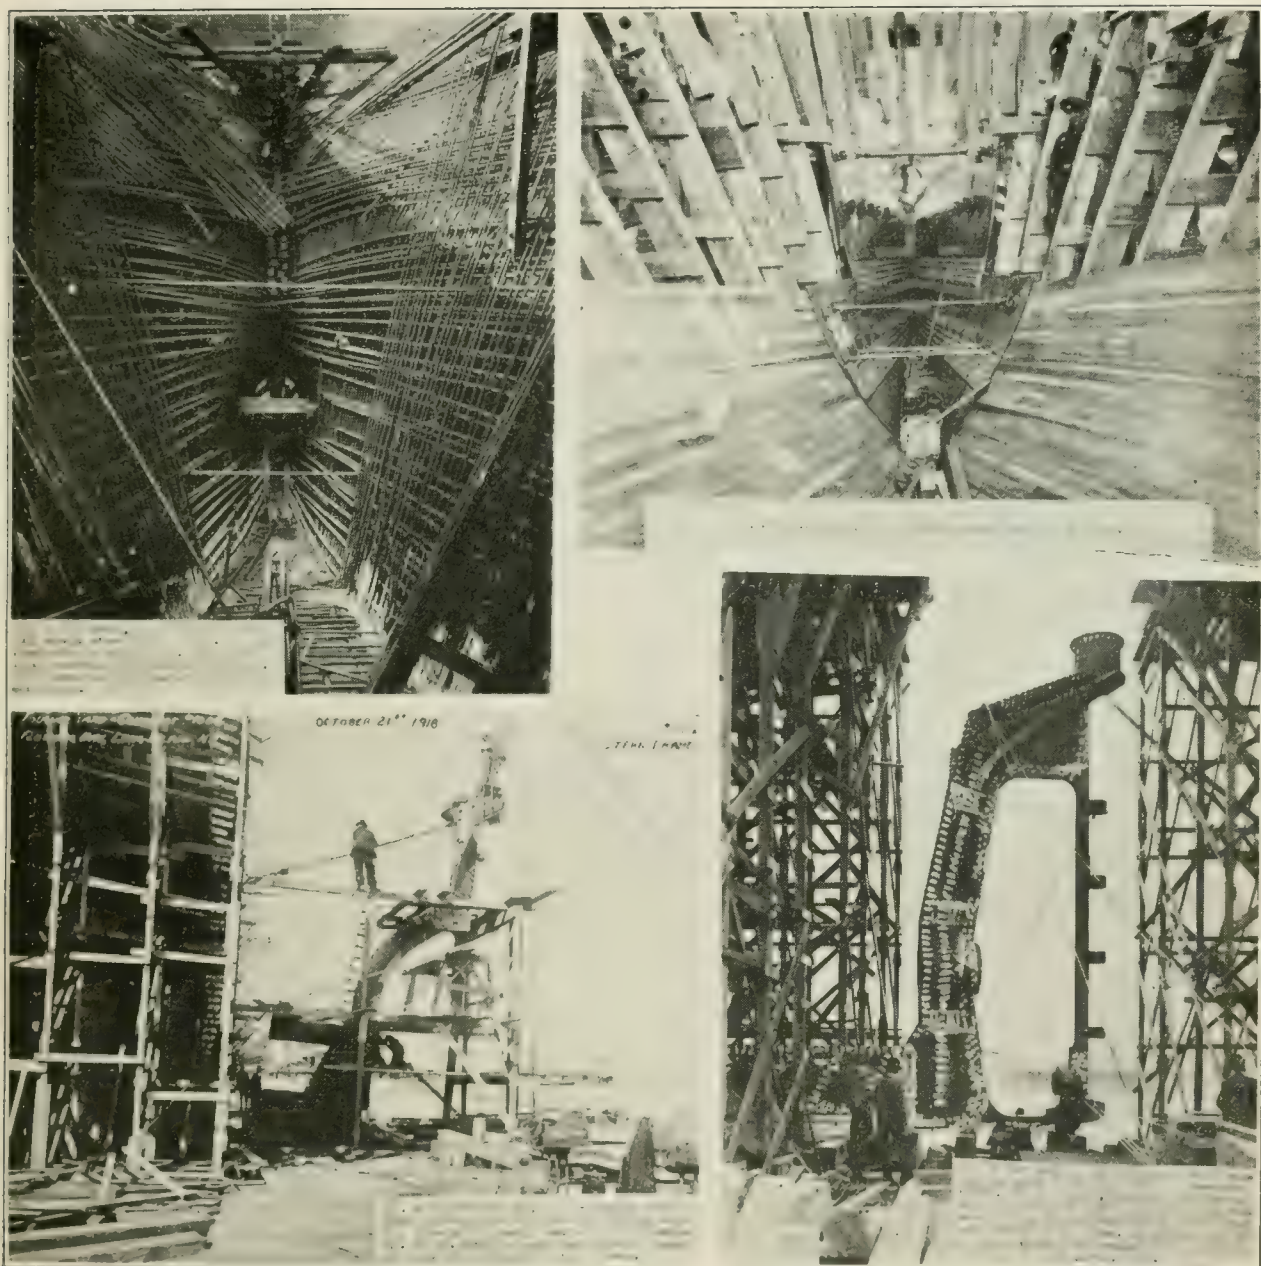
TYPES OF STERN FRAMES USED ON CONCRETE VESSELS.
